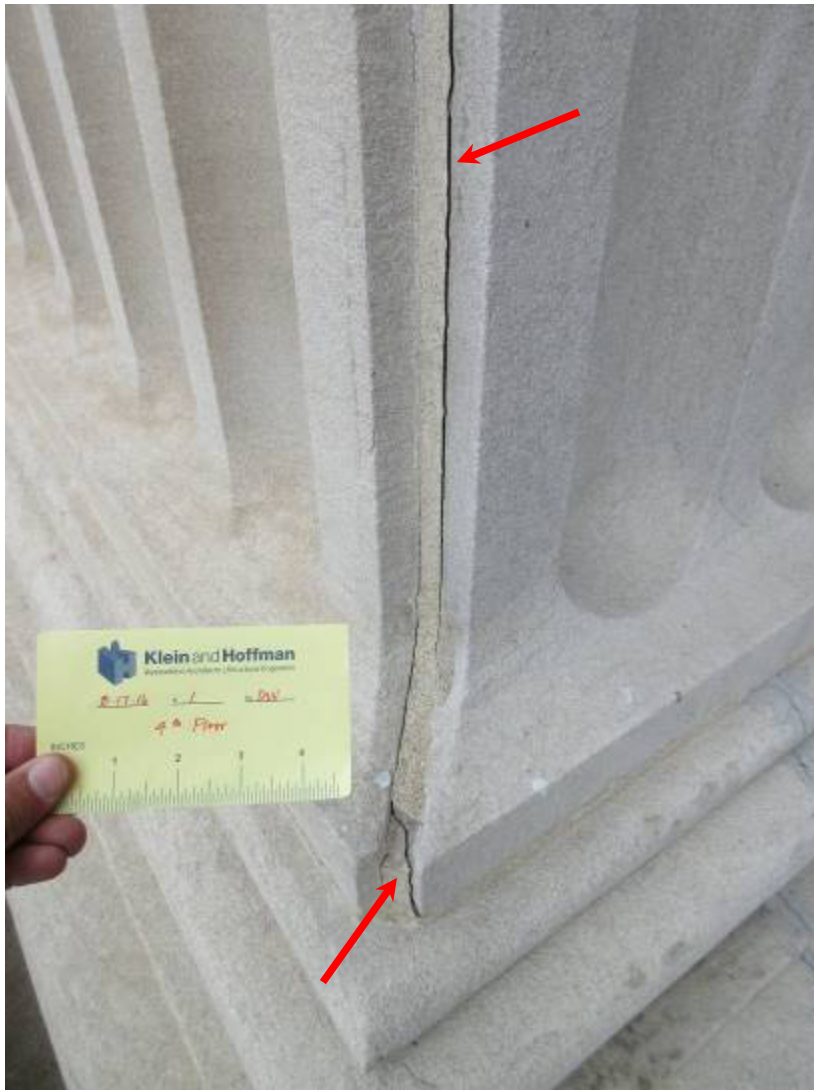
Separation in mortar joint caused by ongoing movement of the stone units.
